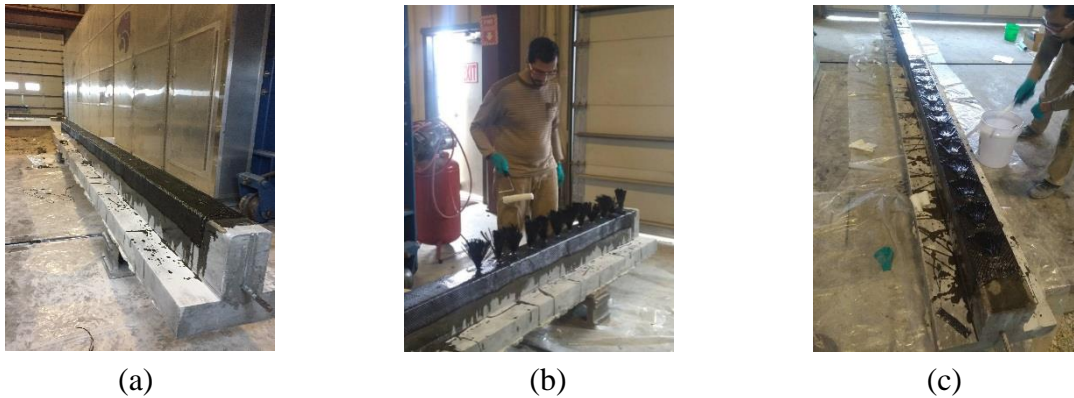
Applications of the CFRP sheets and anchors for beam T2 (a) applying the CFRP sheets; (b) installing the CFRP anchors; (c) impregnating the anchors with epoxy resin
